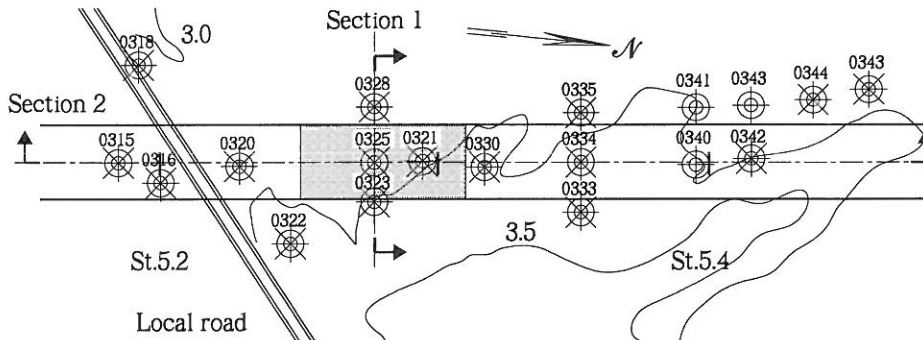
Plan of test embankment (shaded) with detailed geotechnical borings.
